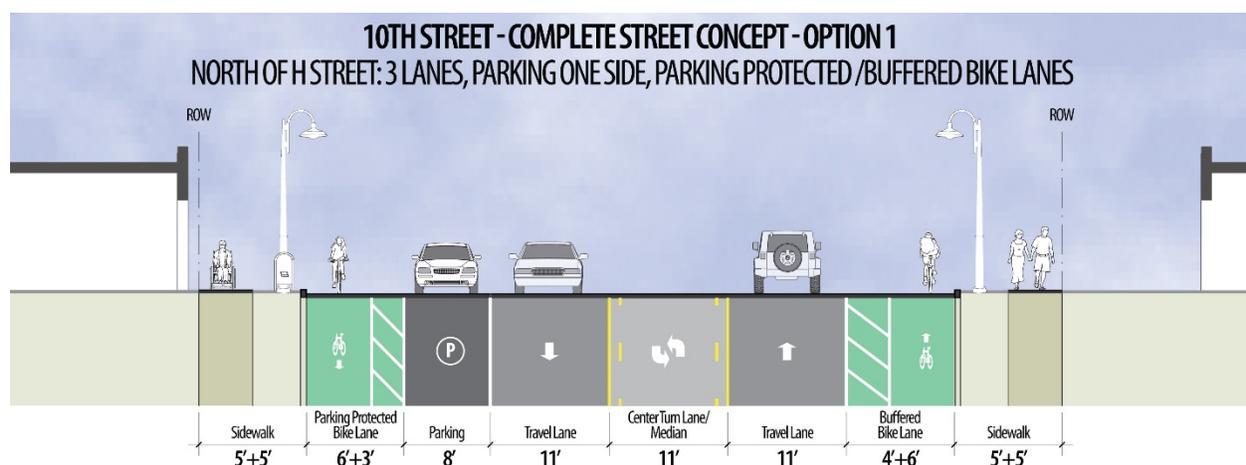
Proposed Complete Street Concept - Option 1 Condition North of H Street
